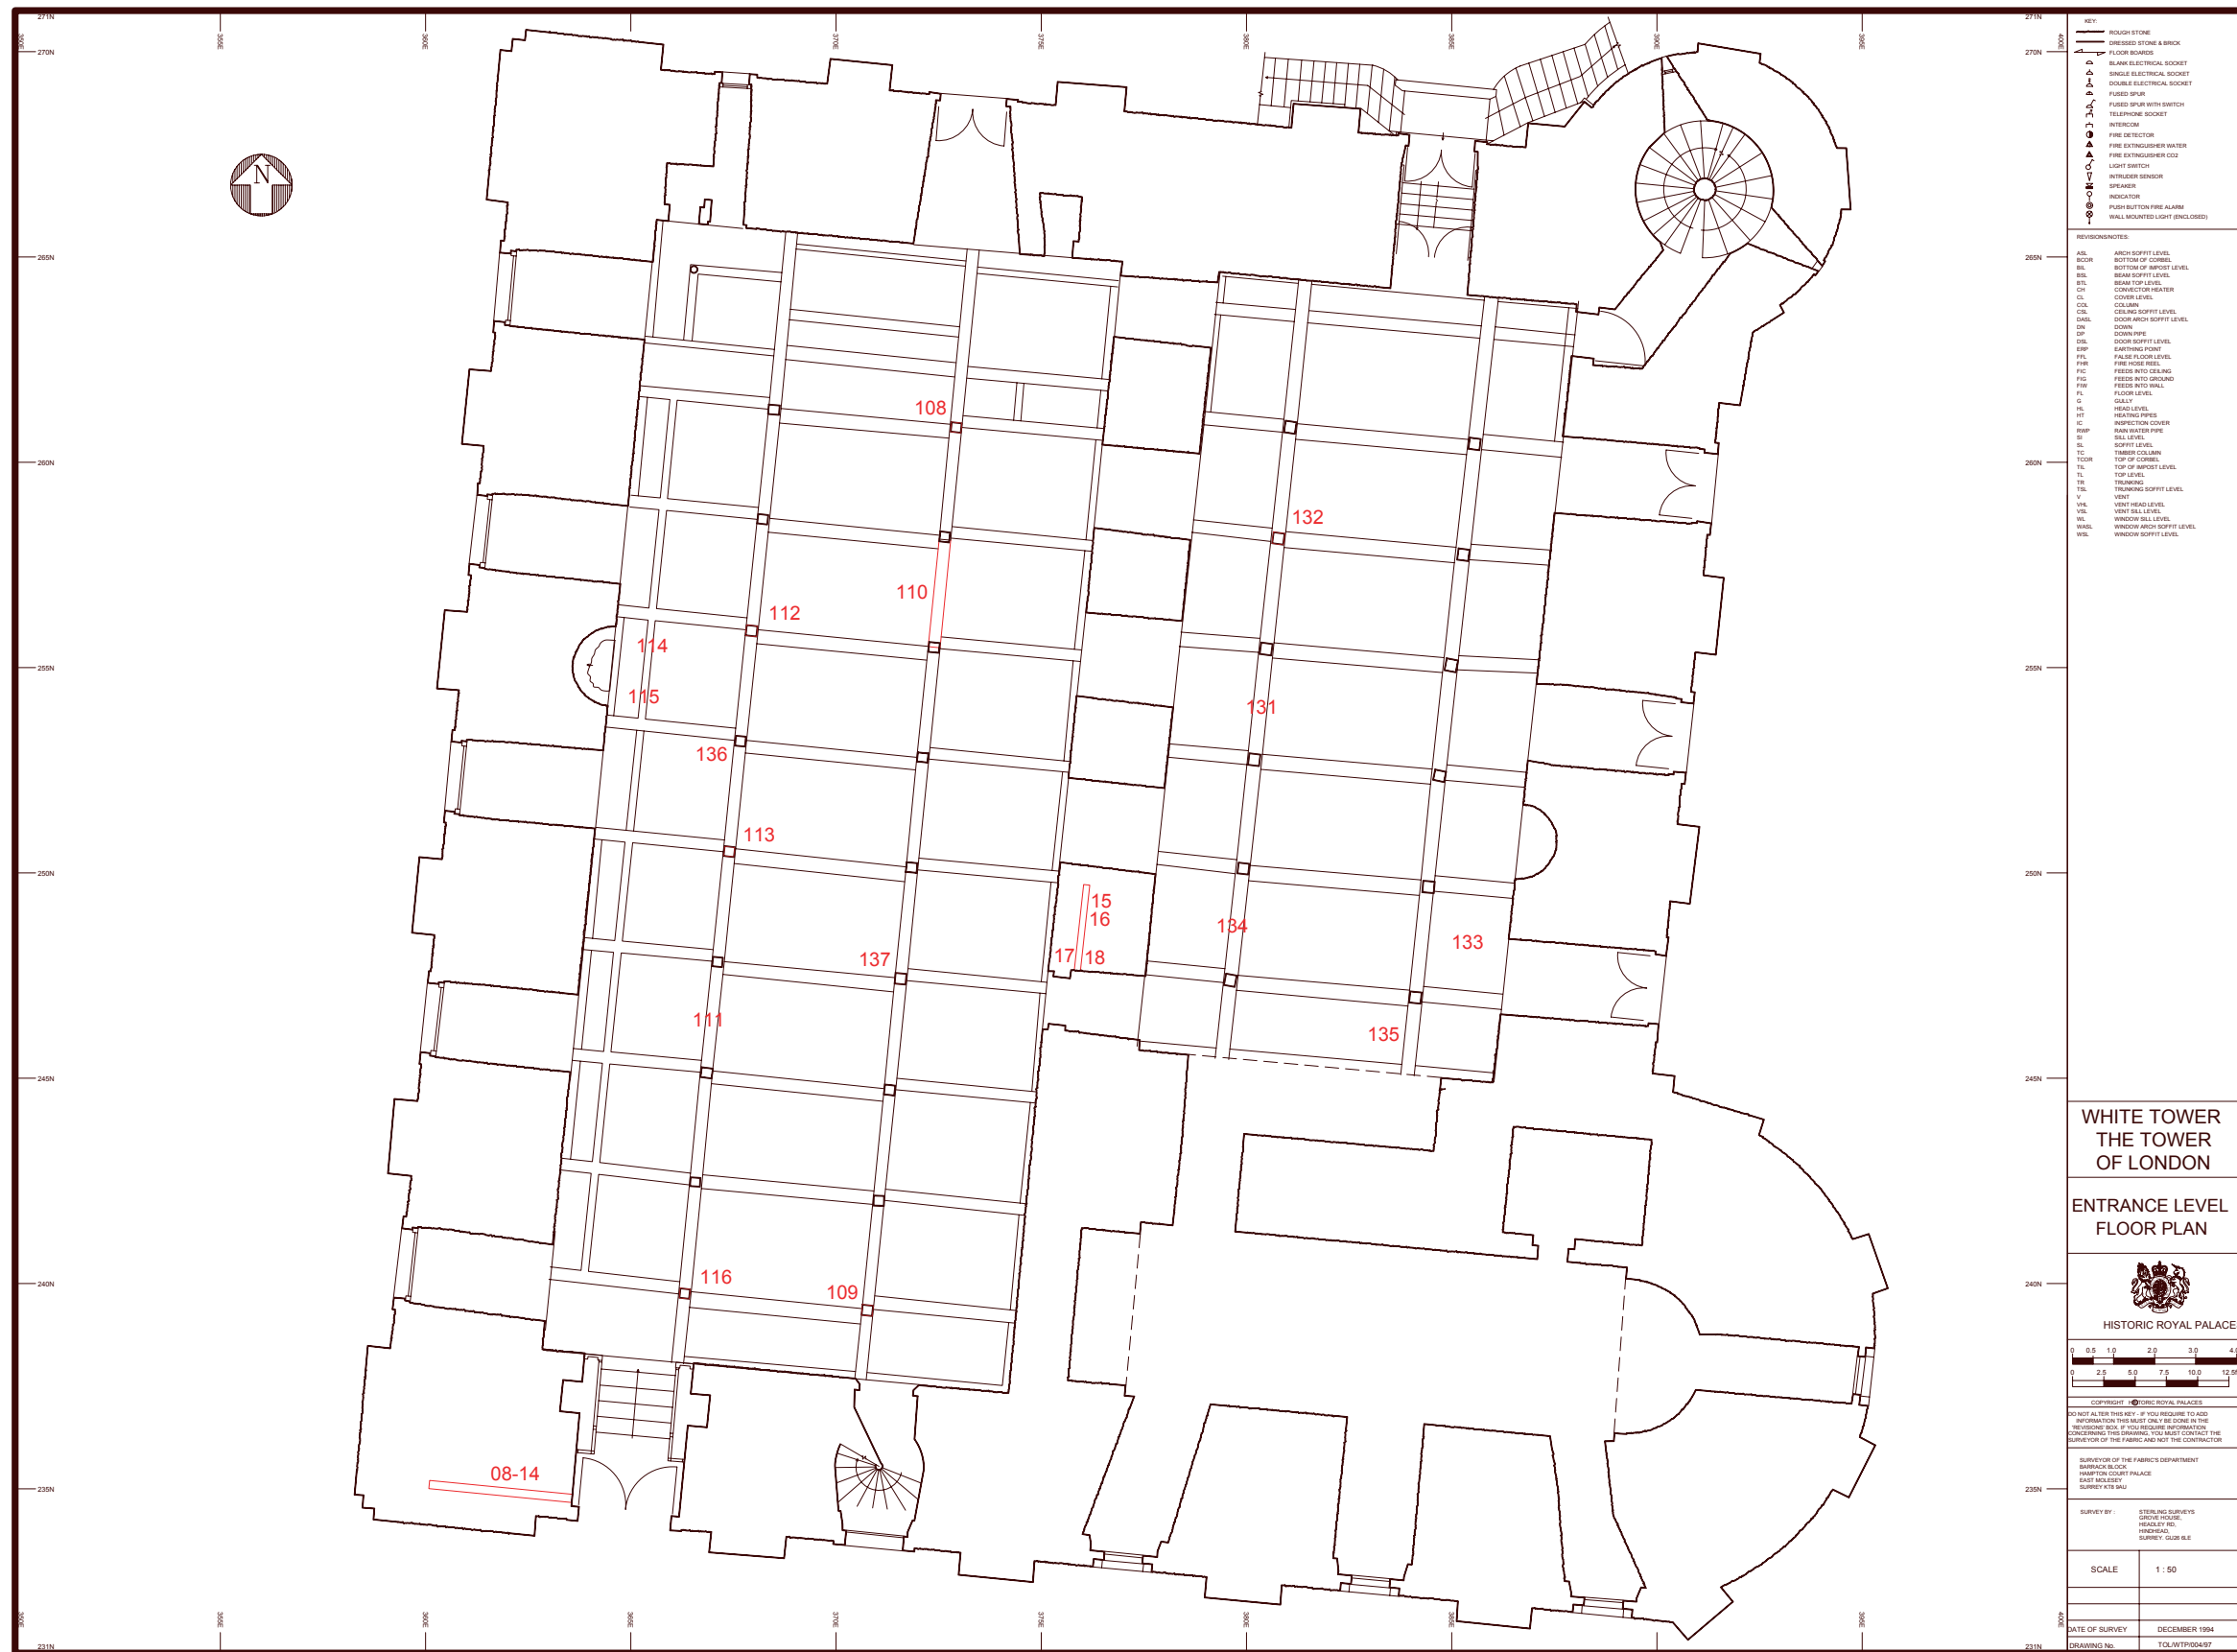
Plan of entrance (ground-floor) level showing locations of timbers sampled (after Historic Royal Palaces)
